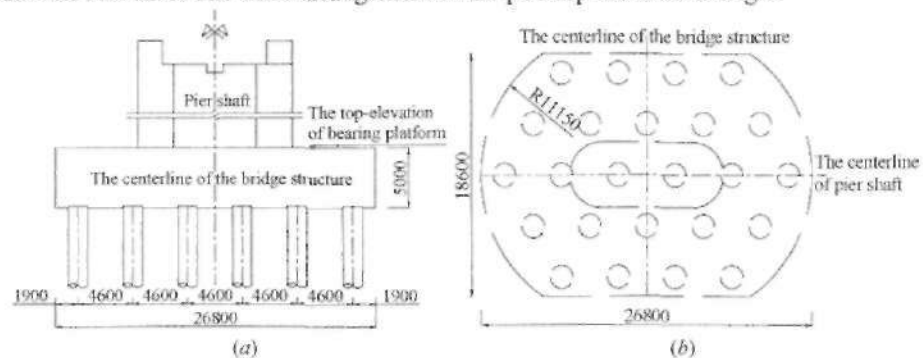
The layout of the main-pier foundation /mm (a: the elevation view; b: the plan view)
